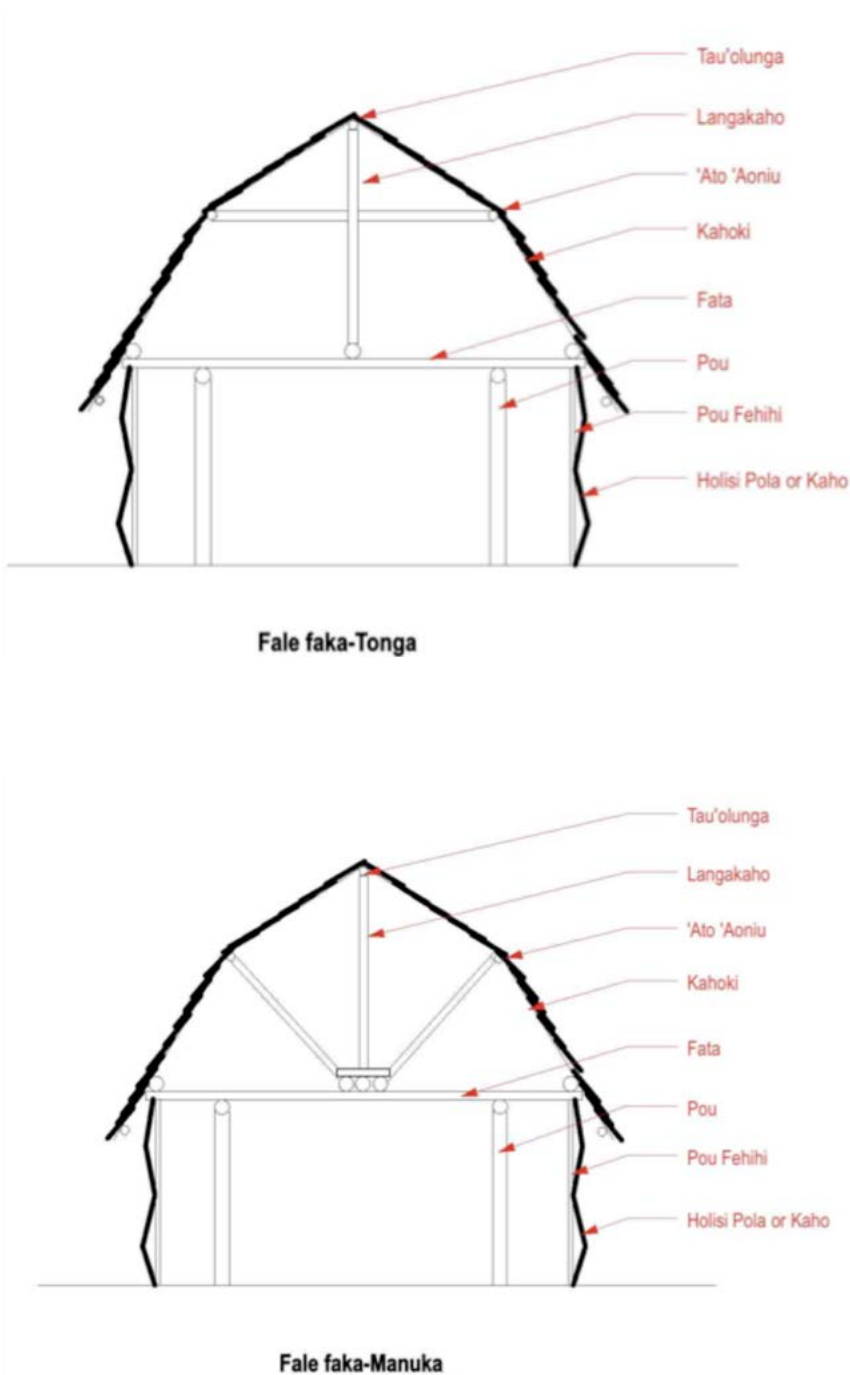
Drawings show sectional views of the Fale faka-Tonga and Fale faka-Manuka. Both have the same oval plan and curved roof however differ in roof configurations (Author, October 2012)
